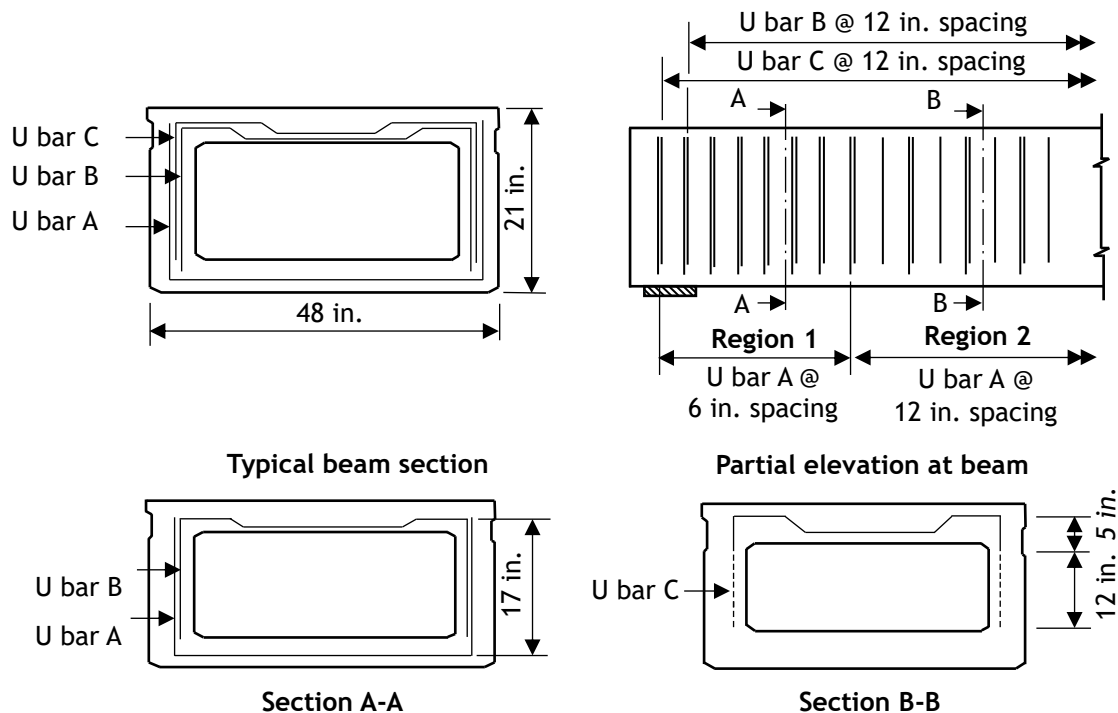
Typical beam section and elevation of B21-48 beam.
